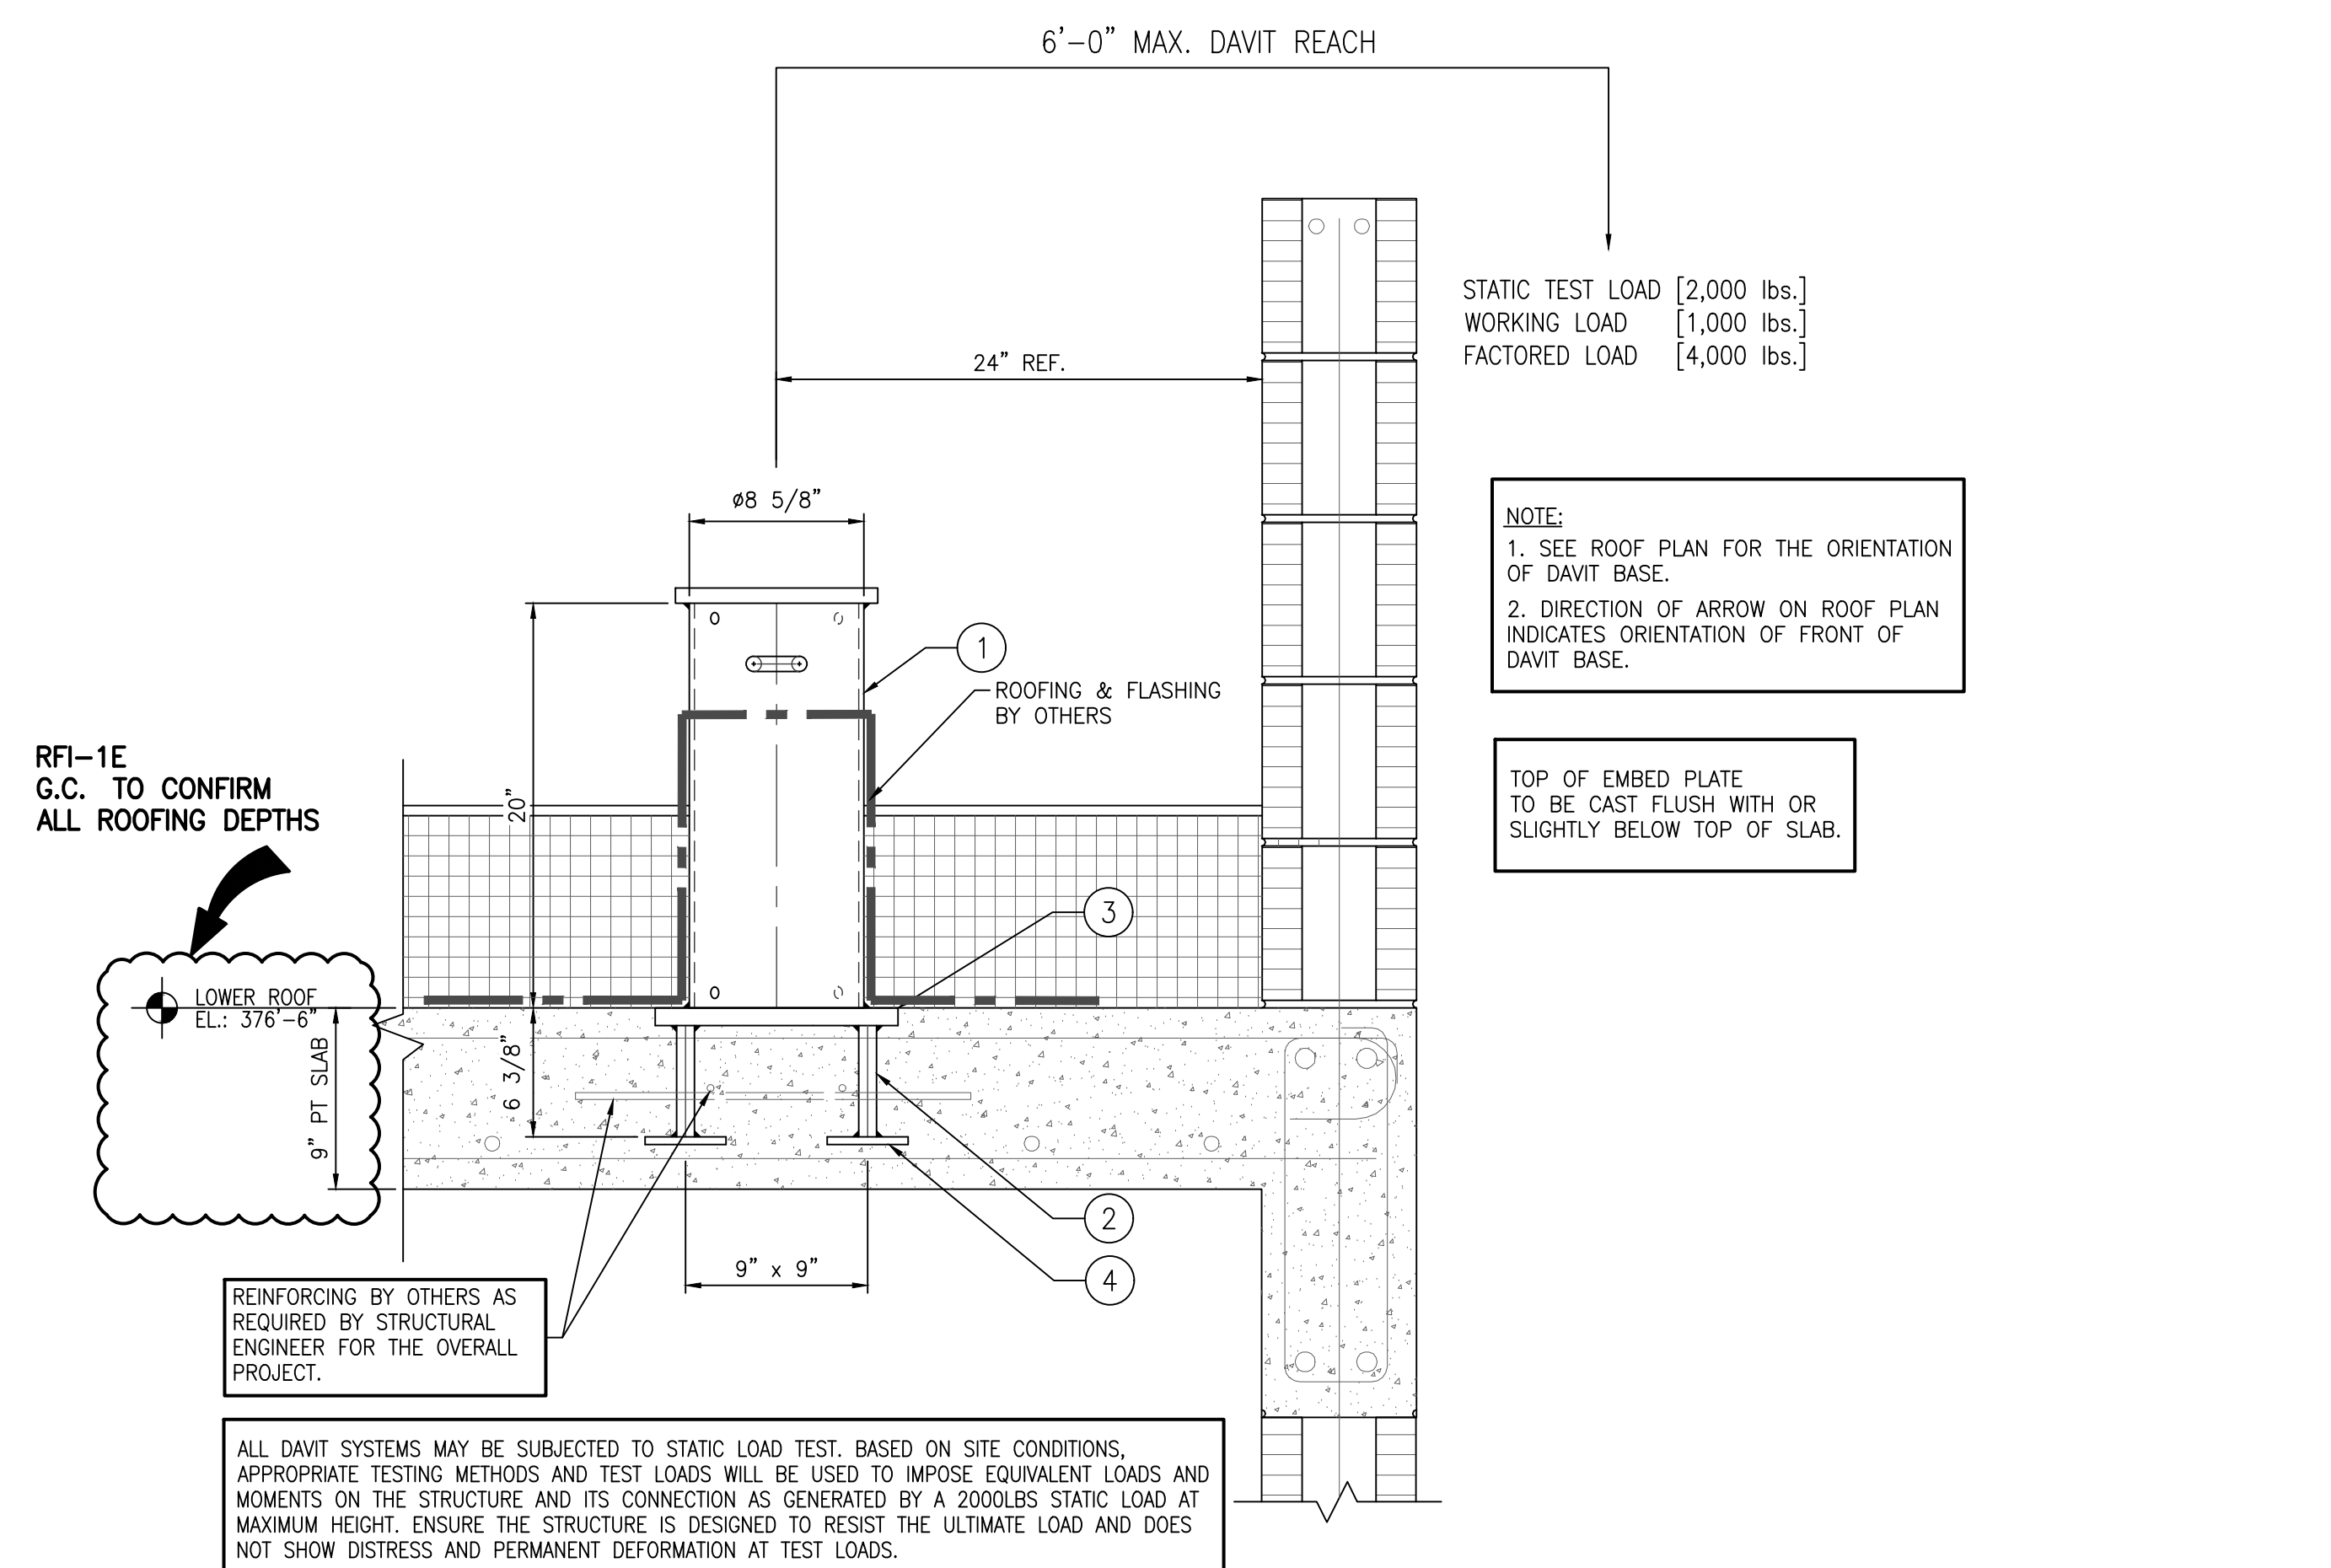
DETAIL FOR DAVIT BASE #DB8~#DB12 ONLY
